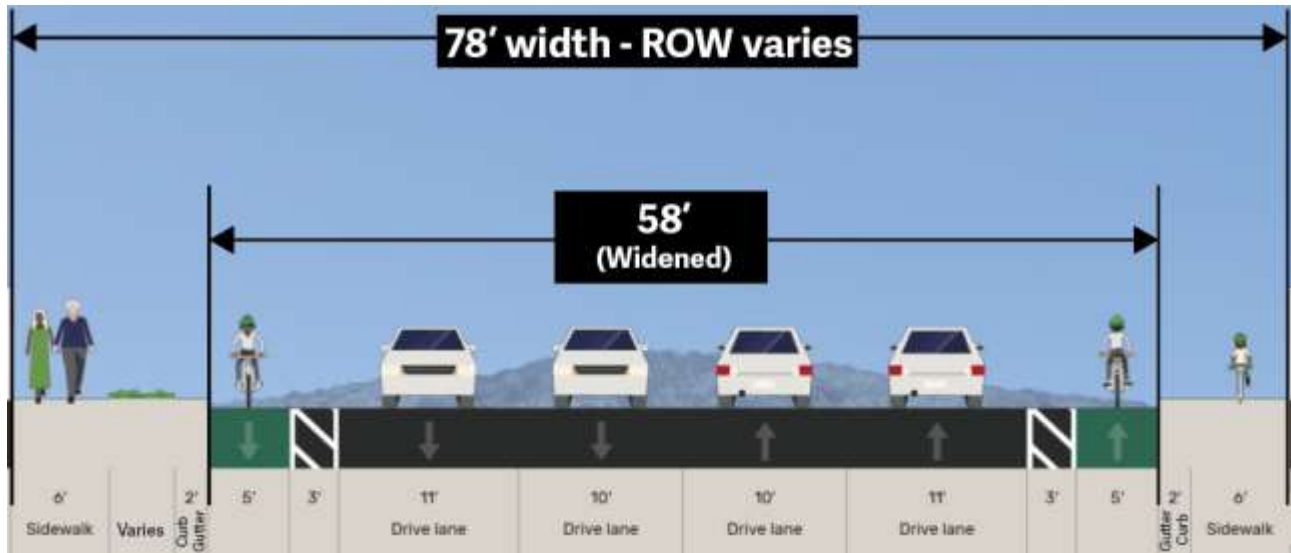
Option 4.1: Four vehicle lanes with on-street protected bike lanes meeting minimum widths and with improvements behind the curb (Looking West)
